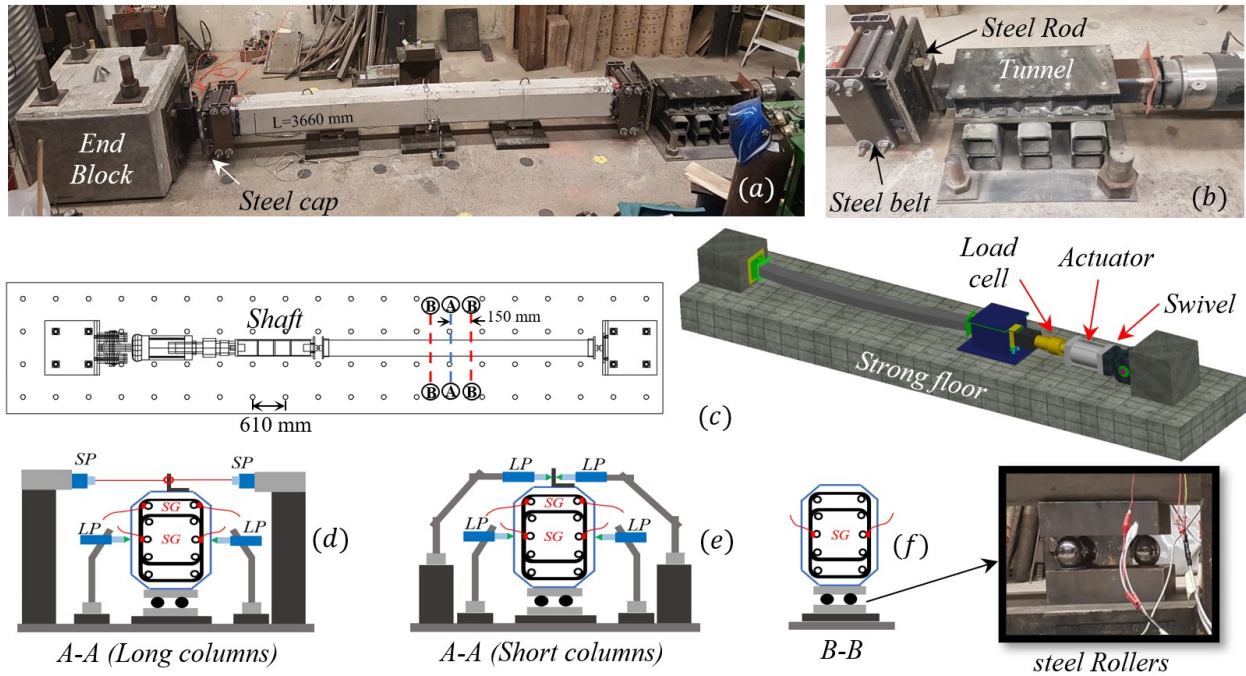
Test set up and instrumentation: (a) test-set up for slender columns; (b) loading detail; (c) schematic test set-up; (d) location of LPs and SPs for long column test set-up; (e) location of LPs for short column test set-up; and (f) strain gauging of sections far from center.
